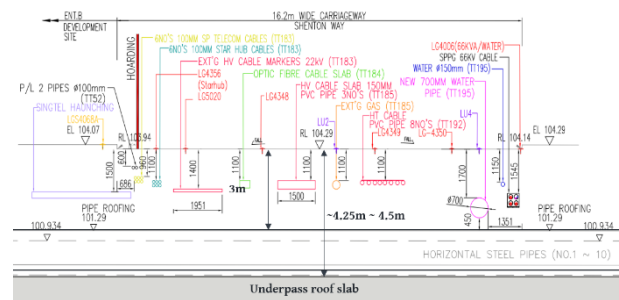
Existing Utilities within soil cover of Pipe Box Tunnel.
